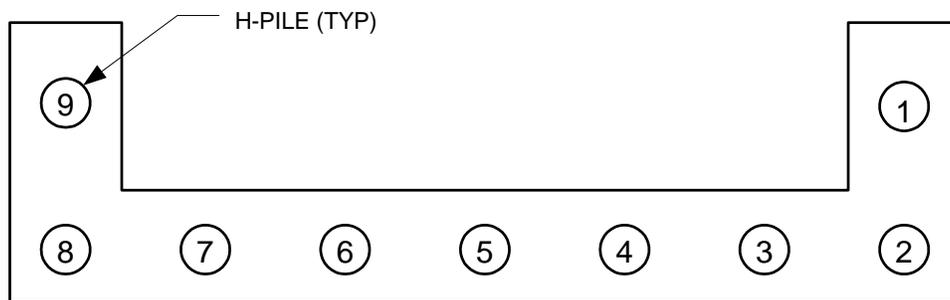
Track 2 Example 1: Pile arrangement at an abutment
